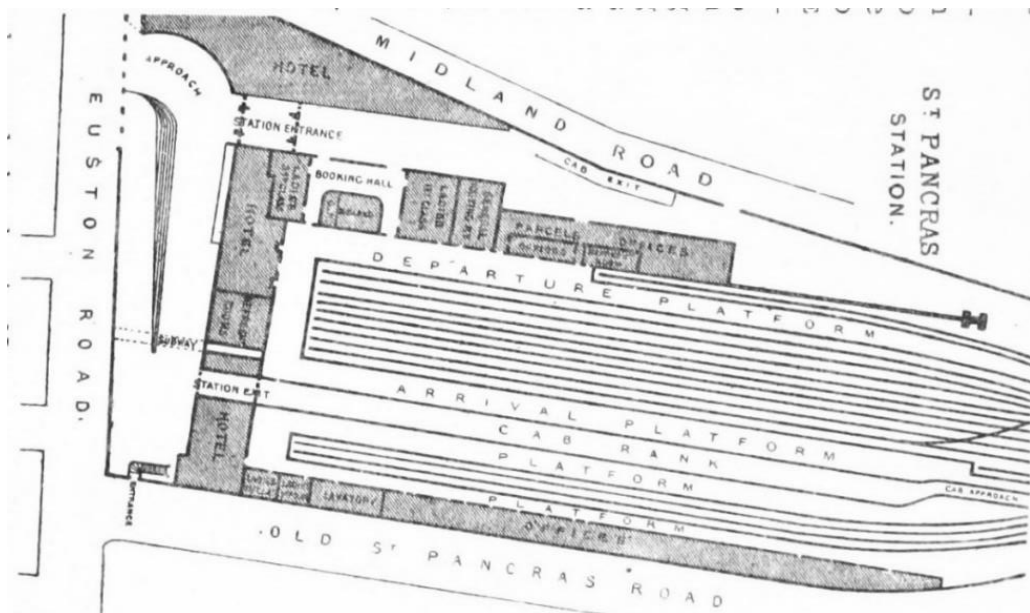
The head house plan type of St Pancras Station with its U-shaped plan created better accessibility [113]
